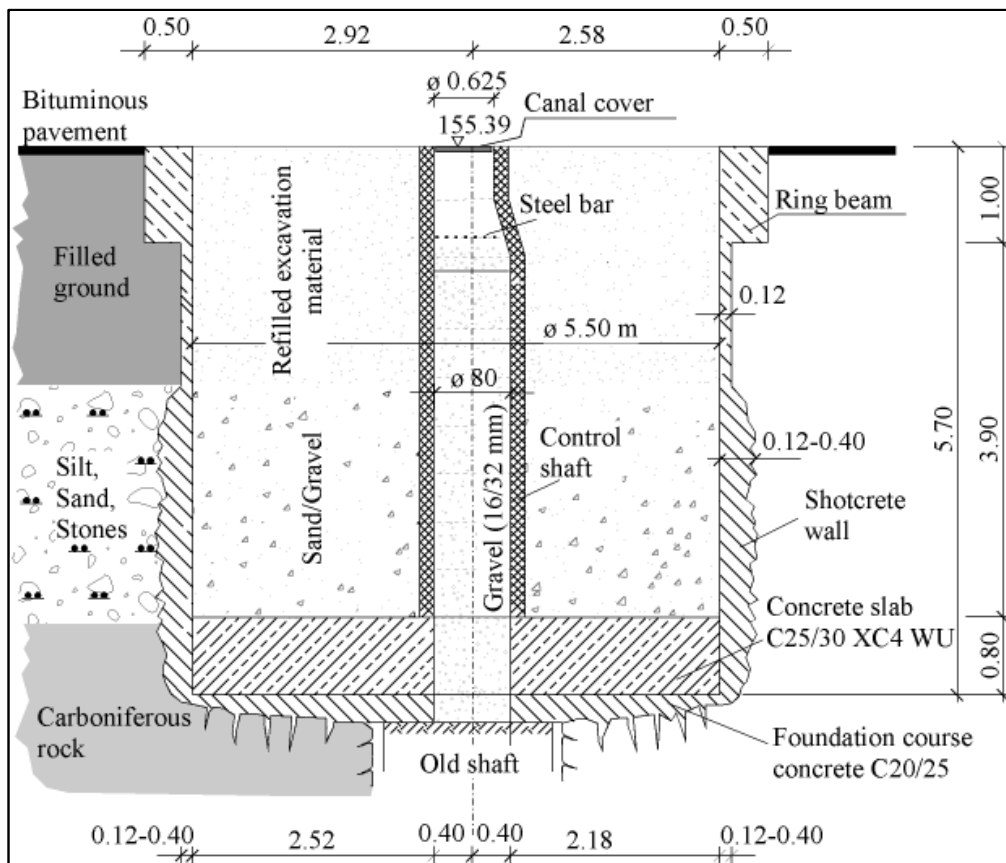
Example of solution of an excavation pit with an old shaft and a reinforced concrete slab
